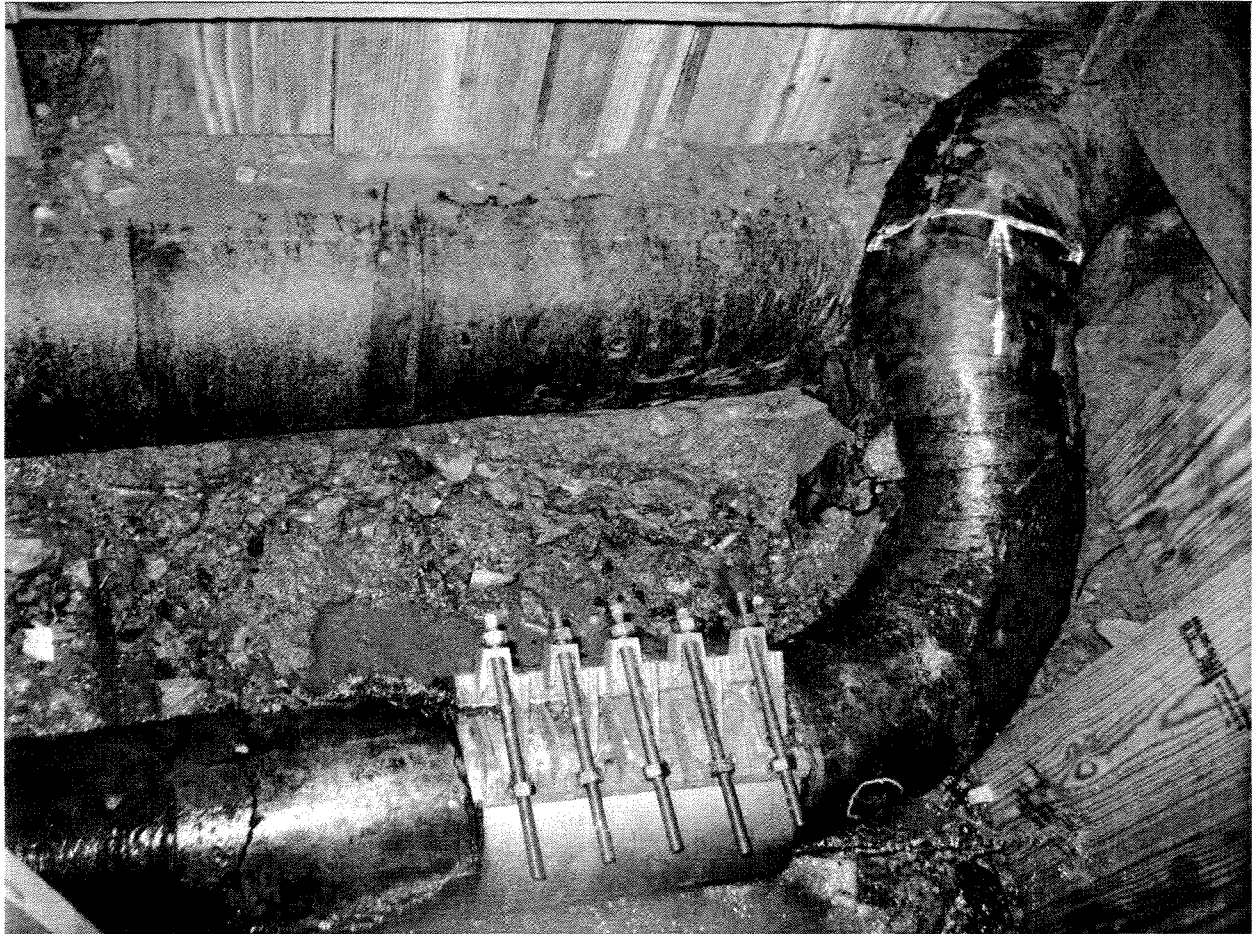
Photograph of pipe in the excavation before removal of the pipe sample.
